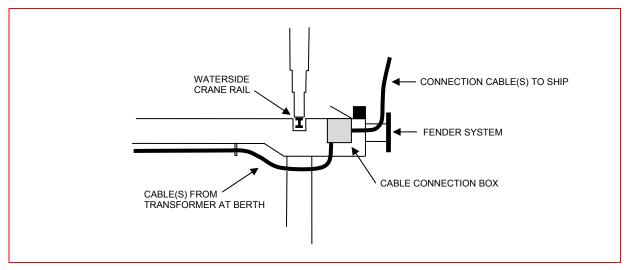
Shore-side connection arrangement fitted into a container terminal between rail and quay.
